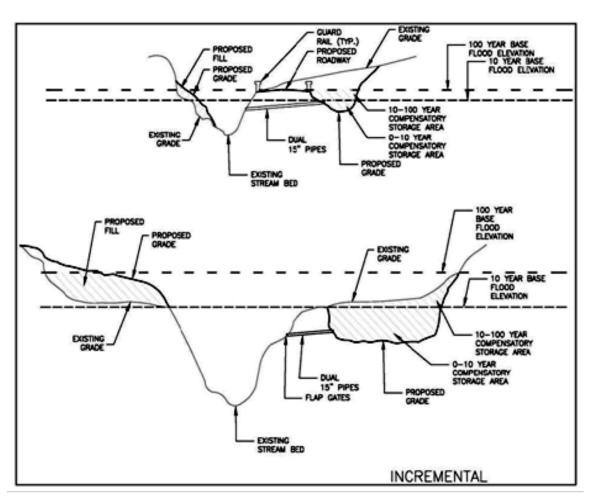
Example of Compensatory Storage Area Connection to Stream through Pipe
